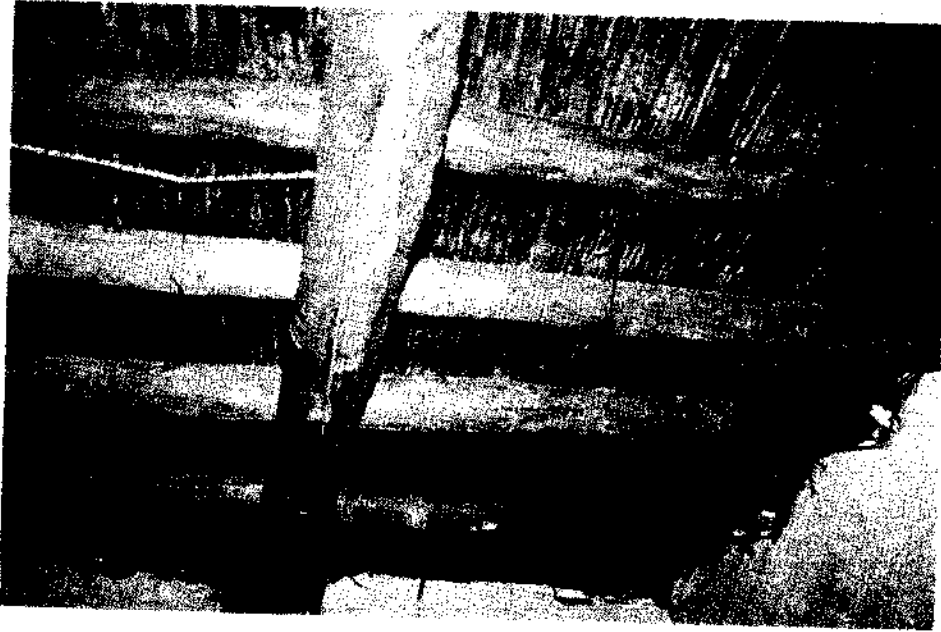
Wooden logs and twigs of *rigal* and *kail* form the roof supporting structure.
